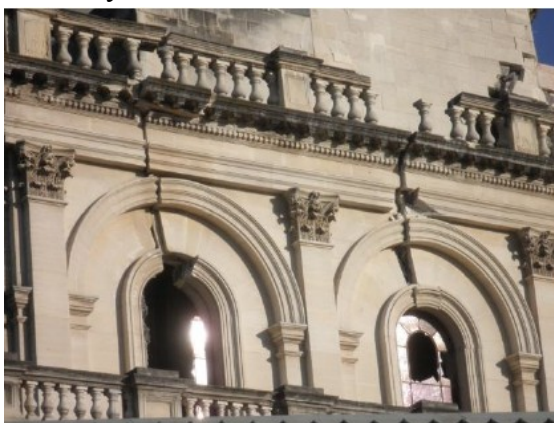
Shear cracks around the upper arcade of the North elevation.
